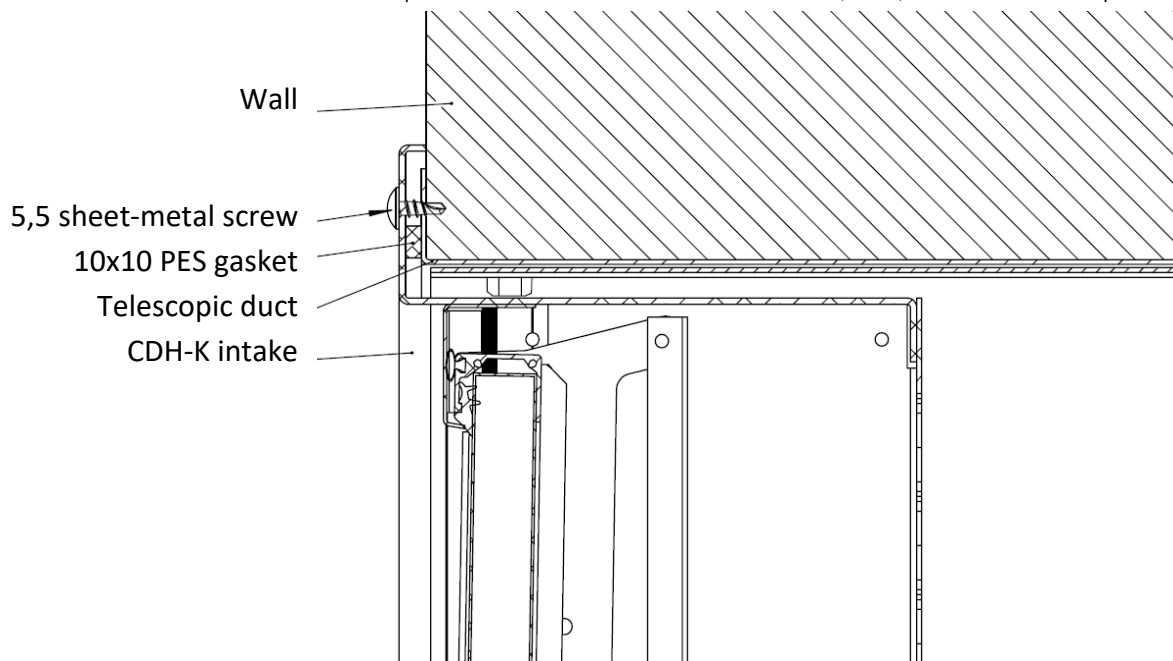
Mounting the CDH-K air intake louver to the telescopic duct.
